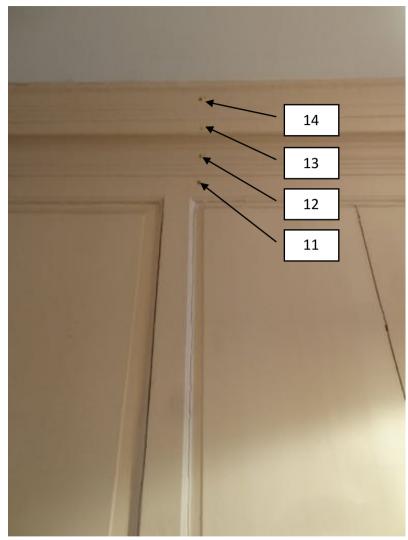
Location of Samples 11-14 on east wall panelling and cornice
